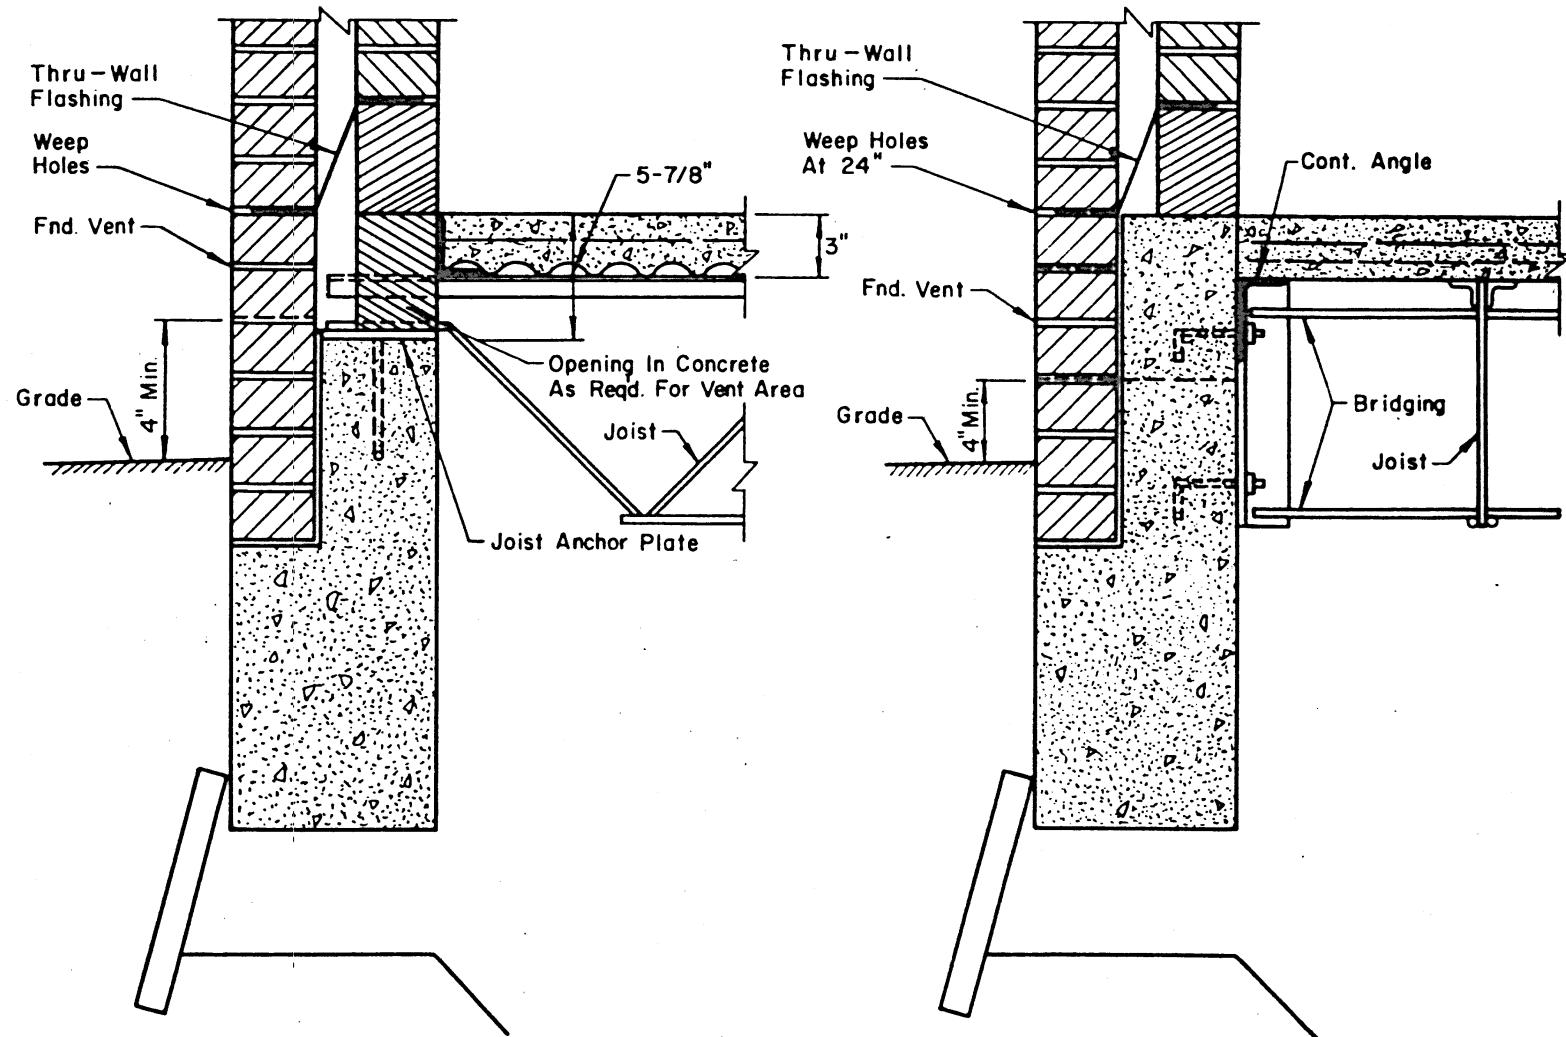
Typical cast-in-place or precast concrete grade beam with steel bar joist floor framing.
